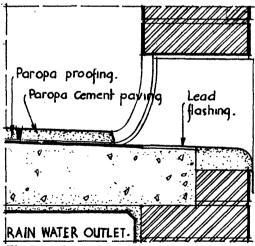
Showing treatment of rain-water outlet in Paropa roofing on concrete (Frazzi Ltd.)
